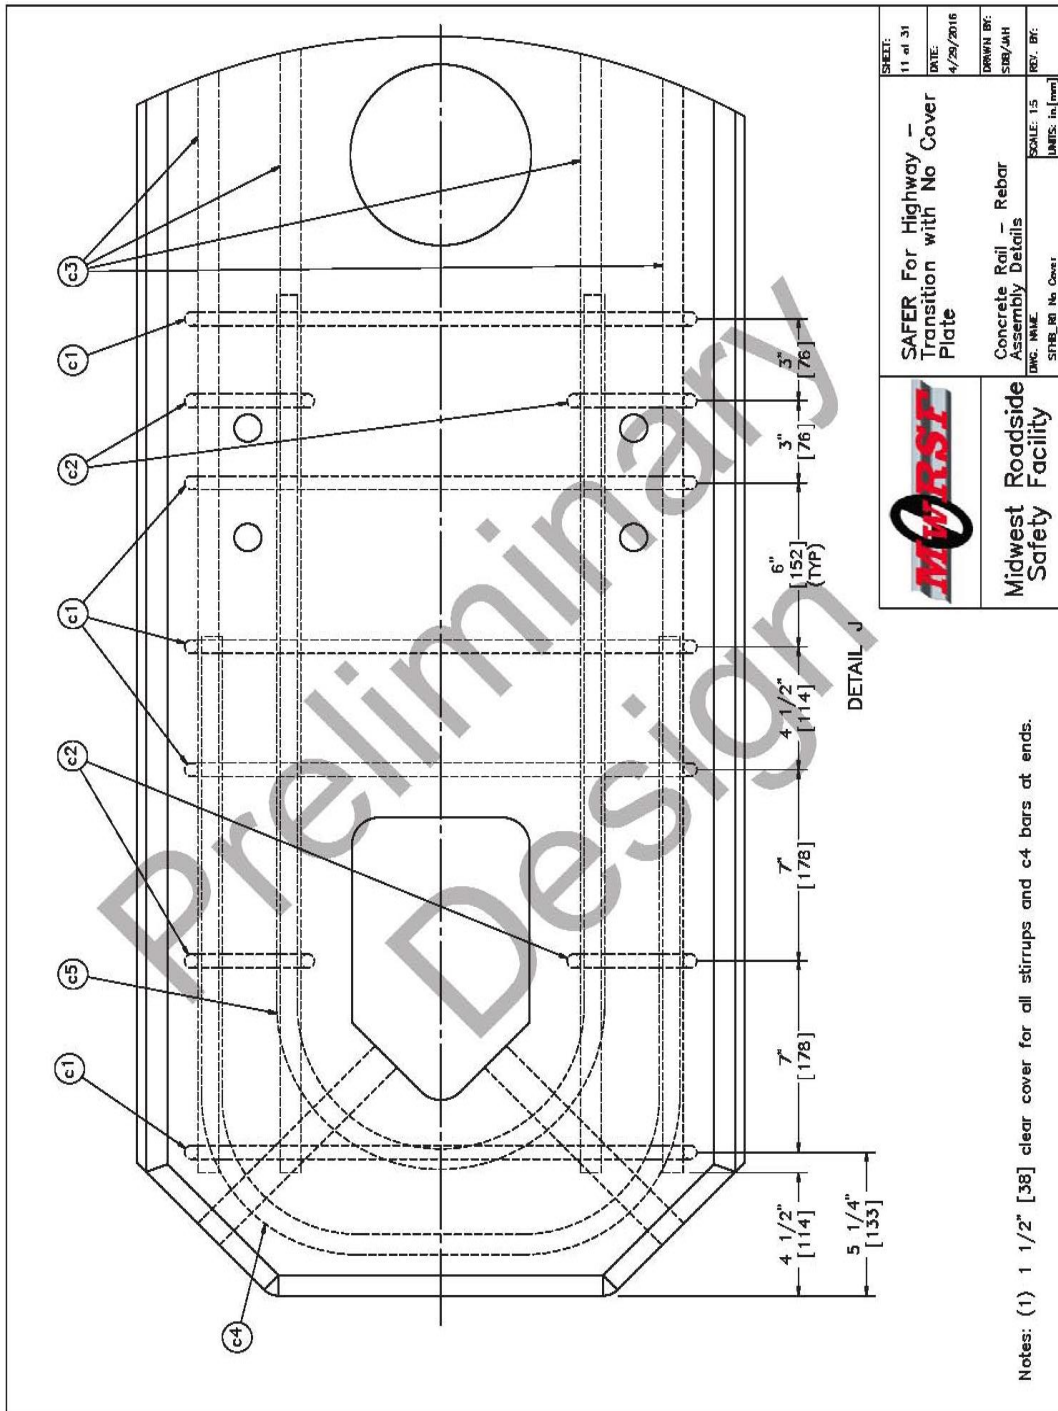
Concrete Rail Rebar Assembly Details, No Cover Plate, RESTORE Barrier Transition
